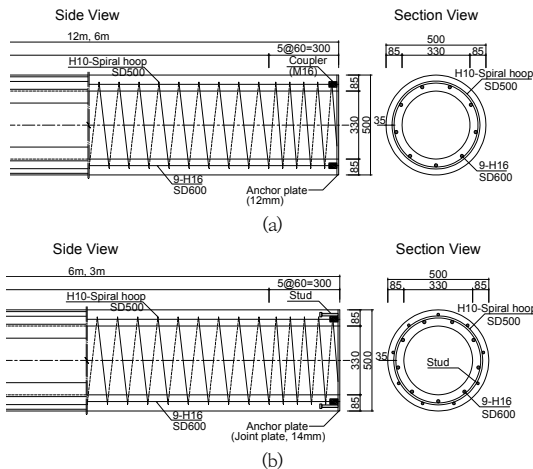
Dimensions of the test samples (a) Without a joint (b) With a joint
